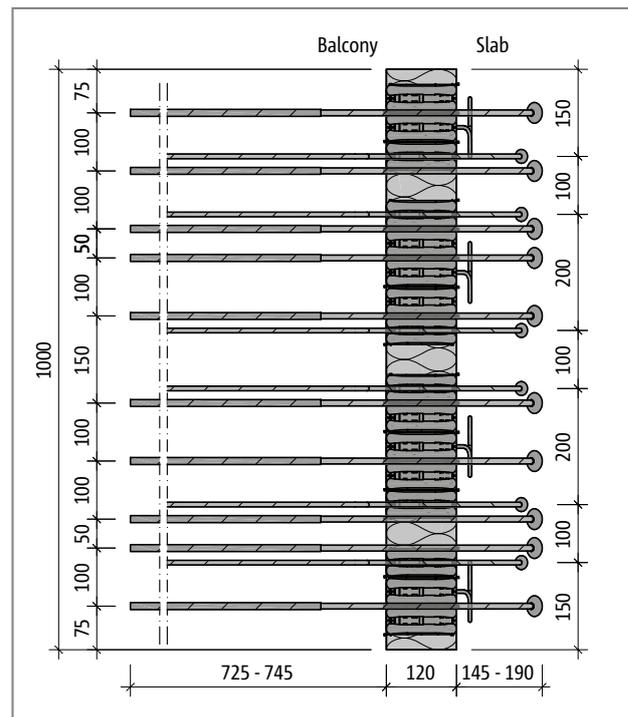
Schöck Isokorb® XT type K-O-M4: Product plan view
